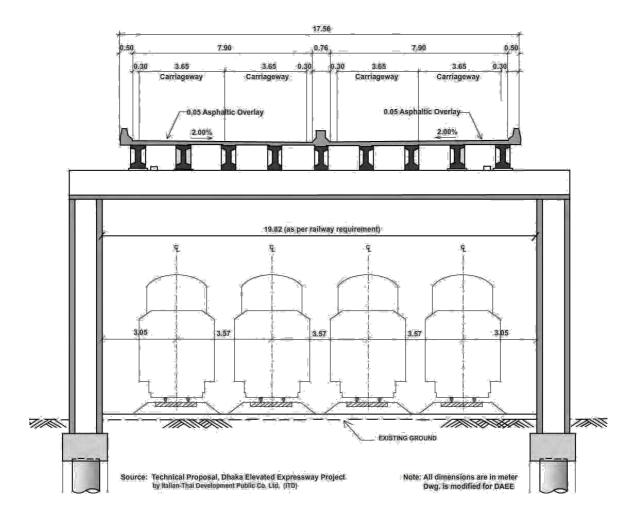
Main Viaduct – I-girder System along Railway Corridor (accommodating 3rd & 4th railway tracks)
